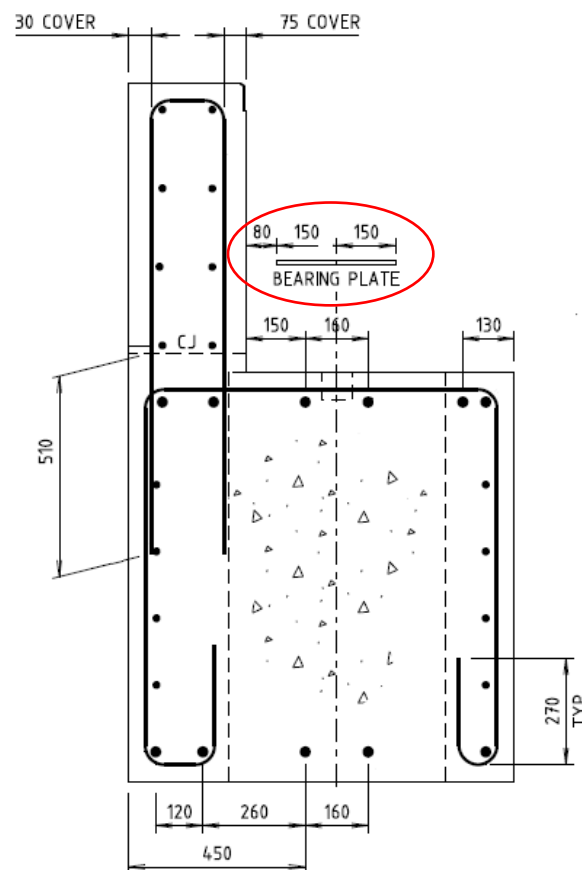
Access for bearing installation (RMS [annotated], 2016)
